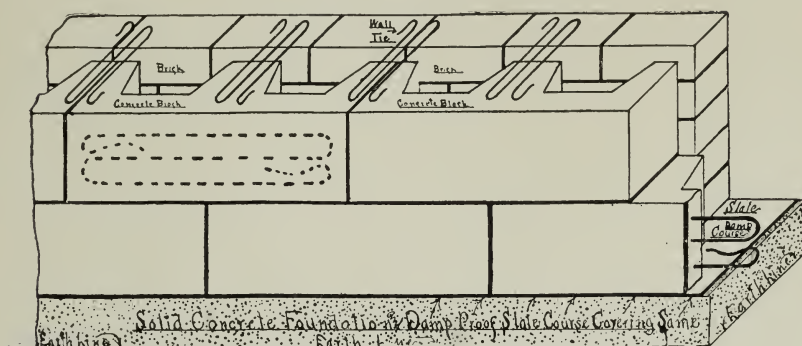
Reinforced Concrete Blocks. Cement Block Backing.
